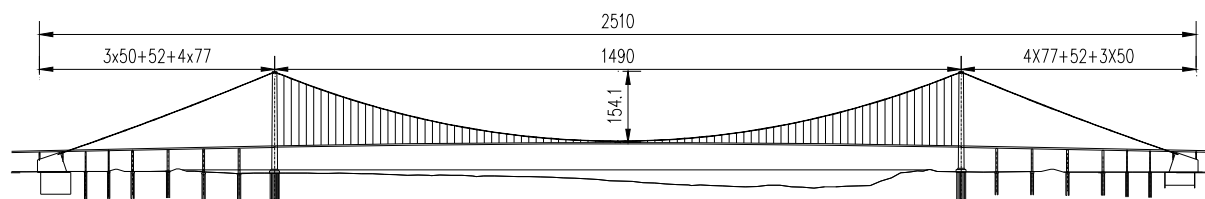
Elevation of Jiangsu Runyang Bridge (Unit: m)
